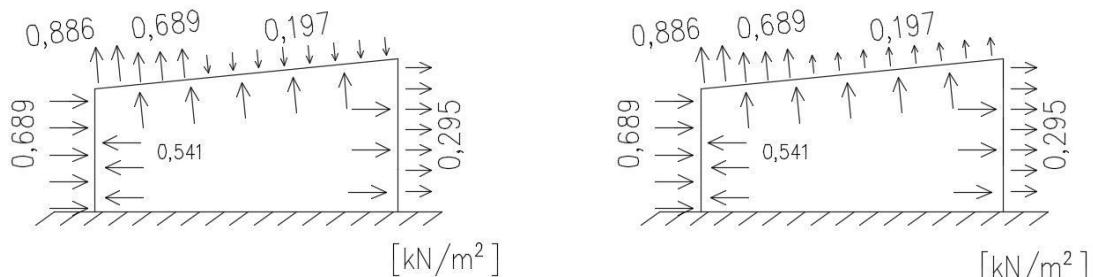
Principle sketch of transversal wind loads (X+)
